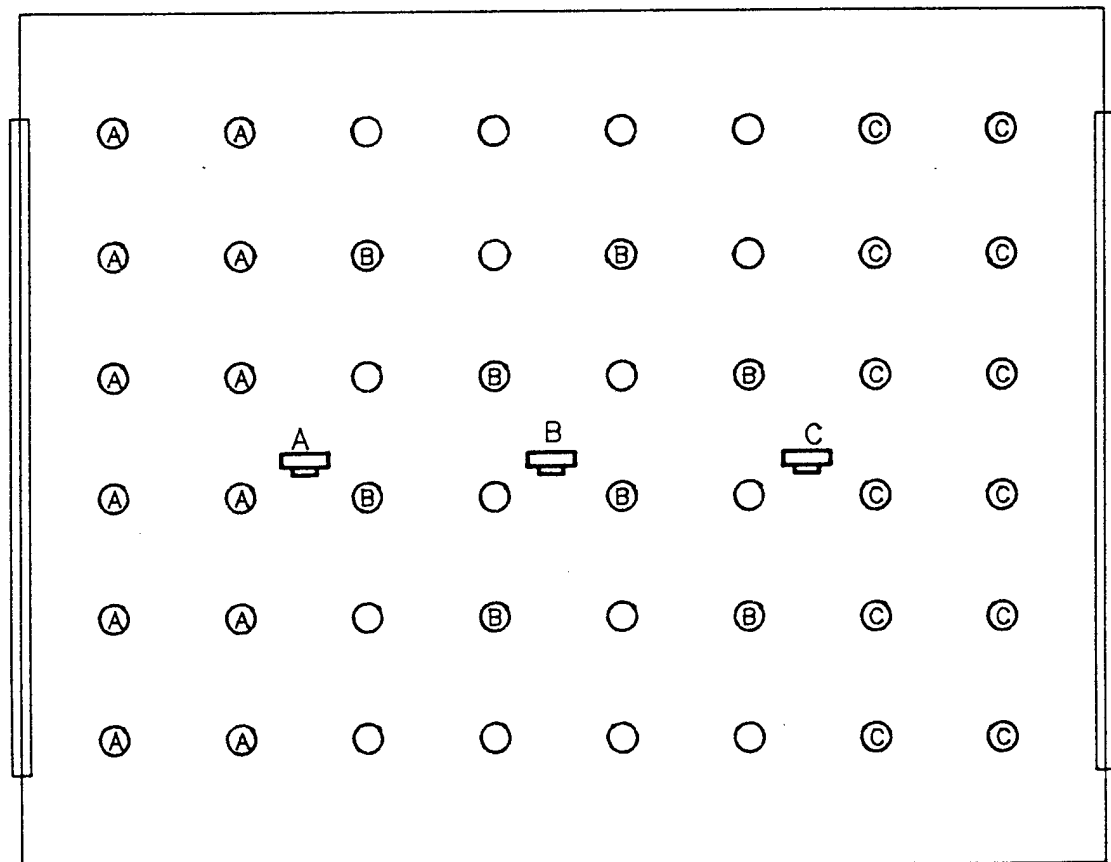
PHOTOCELL CONTROL LAYOUT - BUILDING 5256
